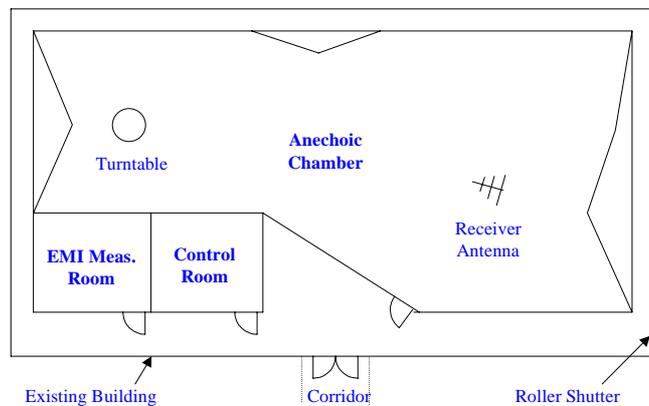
Floor plan of the Asymmetrical-shaped Chamber.
